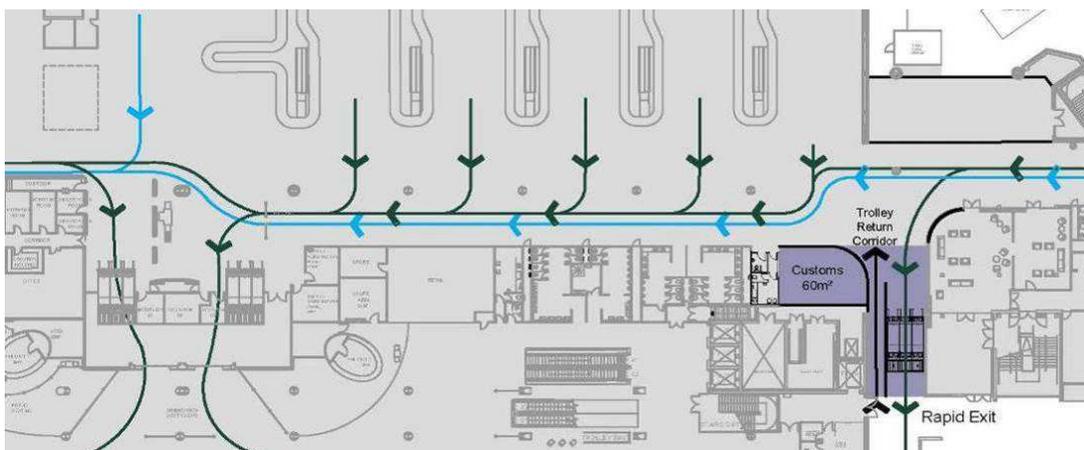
Proposed Rapid Exit at Terminal 1 Baggage Reclaim hall
